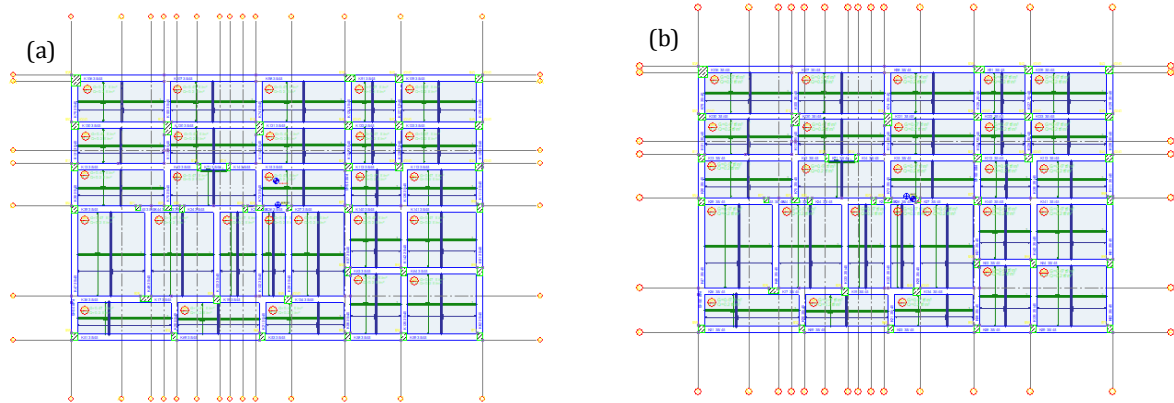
Structure plan before reinforcement: (a) Ground floor; (b) 1<sup>st</sup> floor.
